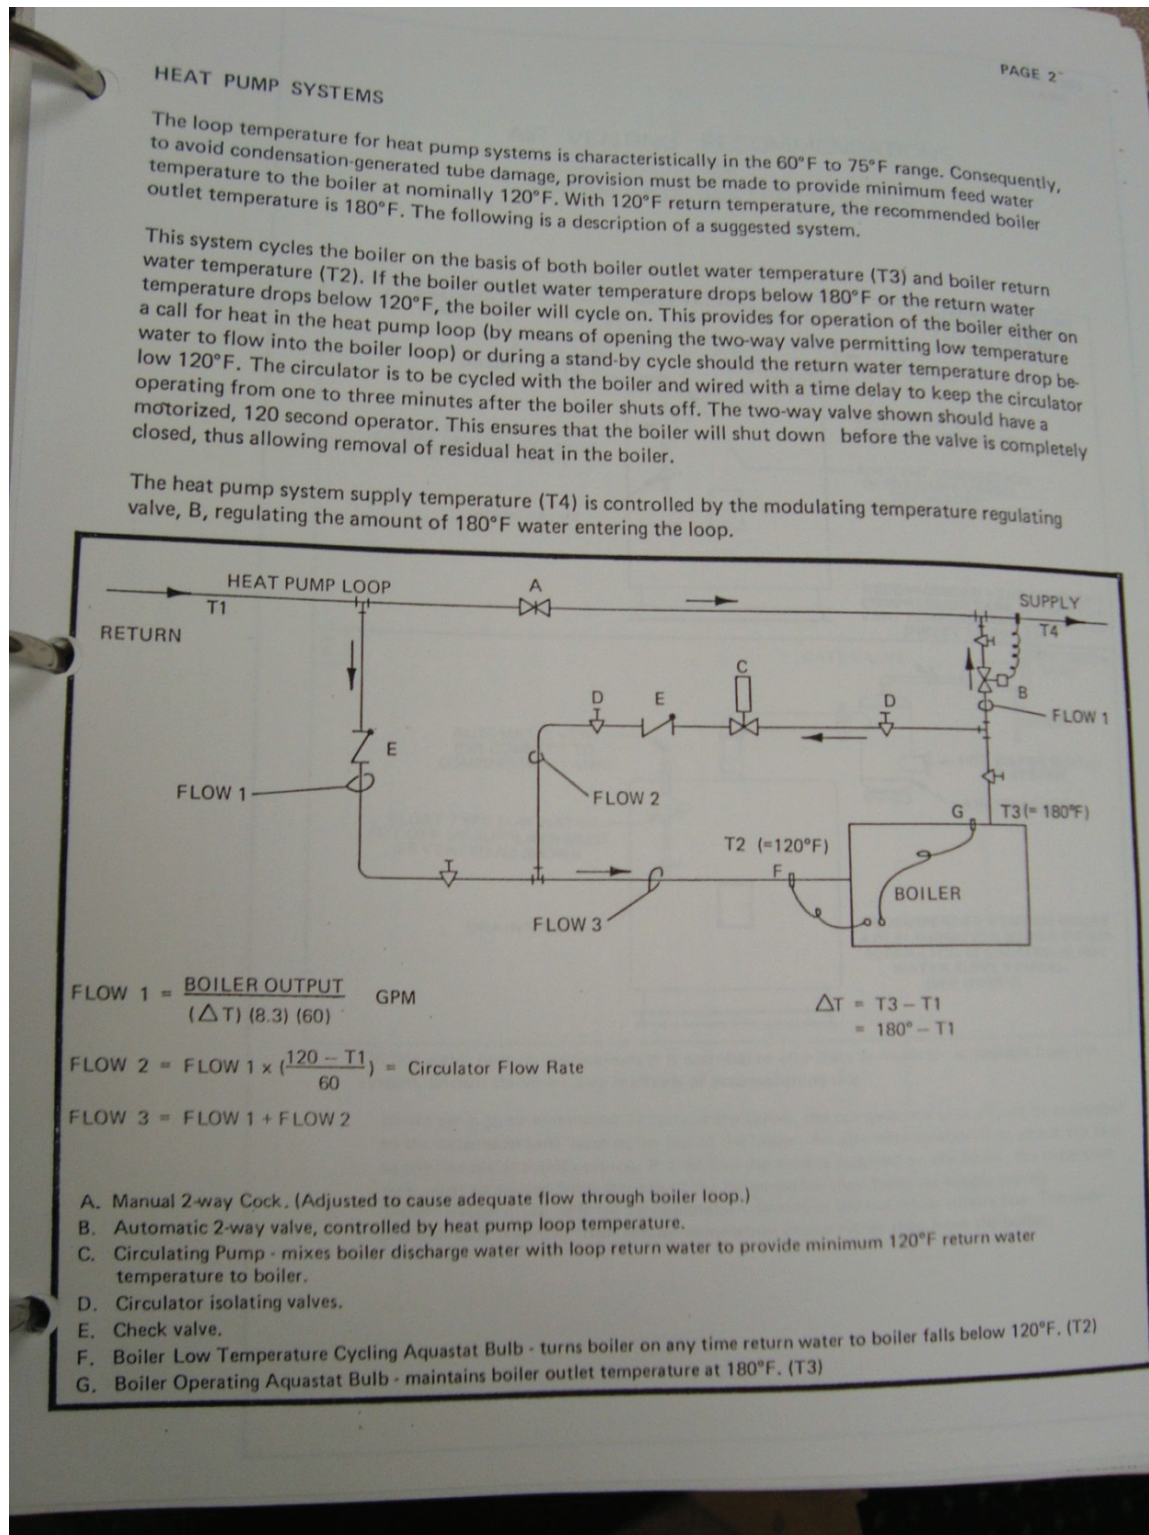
Boiler manufacturer design schematic requiring return temperatures greater than 120°F.
